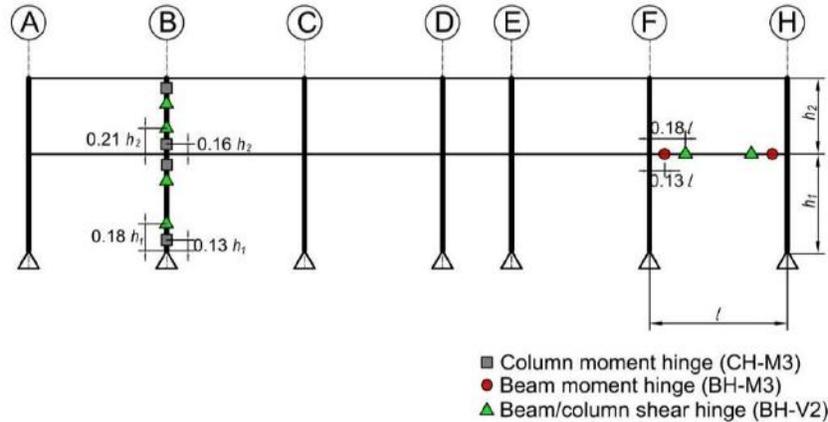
Typical plastic hinge locations for Frame 1 (RS1).
